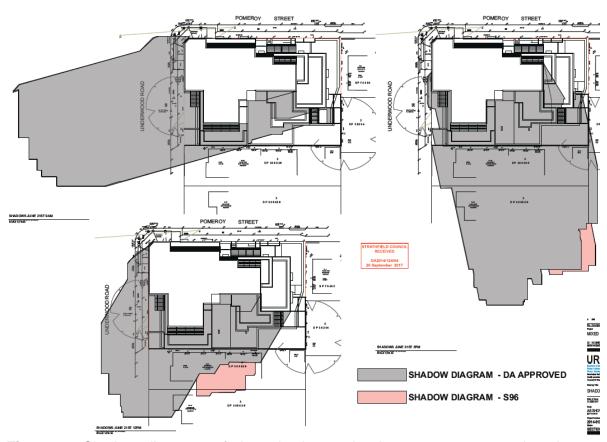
Shadow diagrams of the mixed use development as approved and as modified incorporating the two additional units and communal open space.
